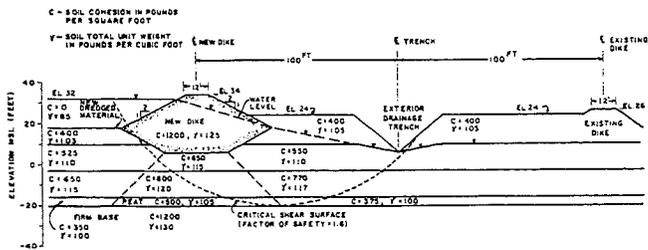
SOIL PROFILE AND DIKE STABILITY-STAGE 1
